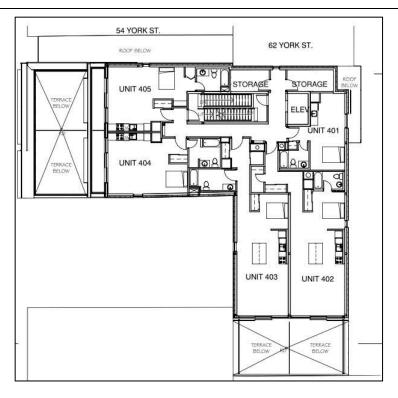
Exhibit F: Fourth Floor Plan of the Proposed Redevelopment.
